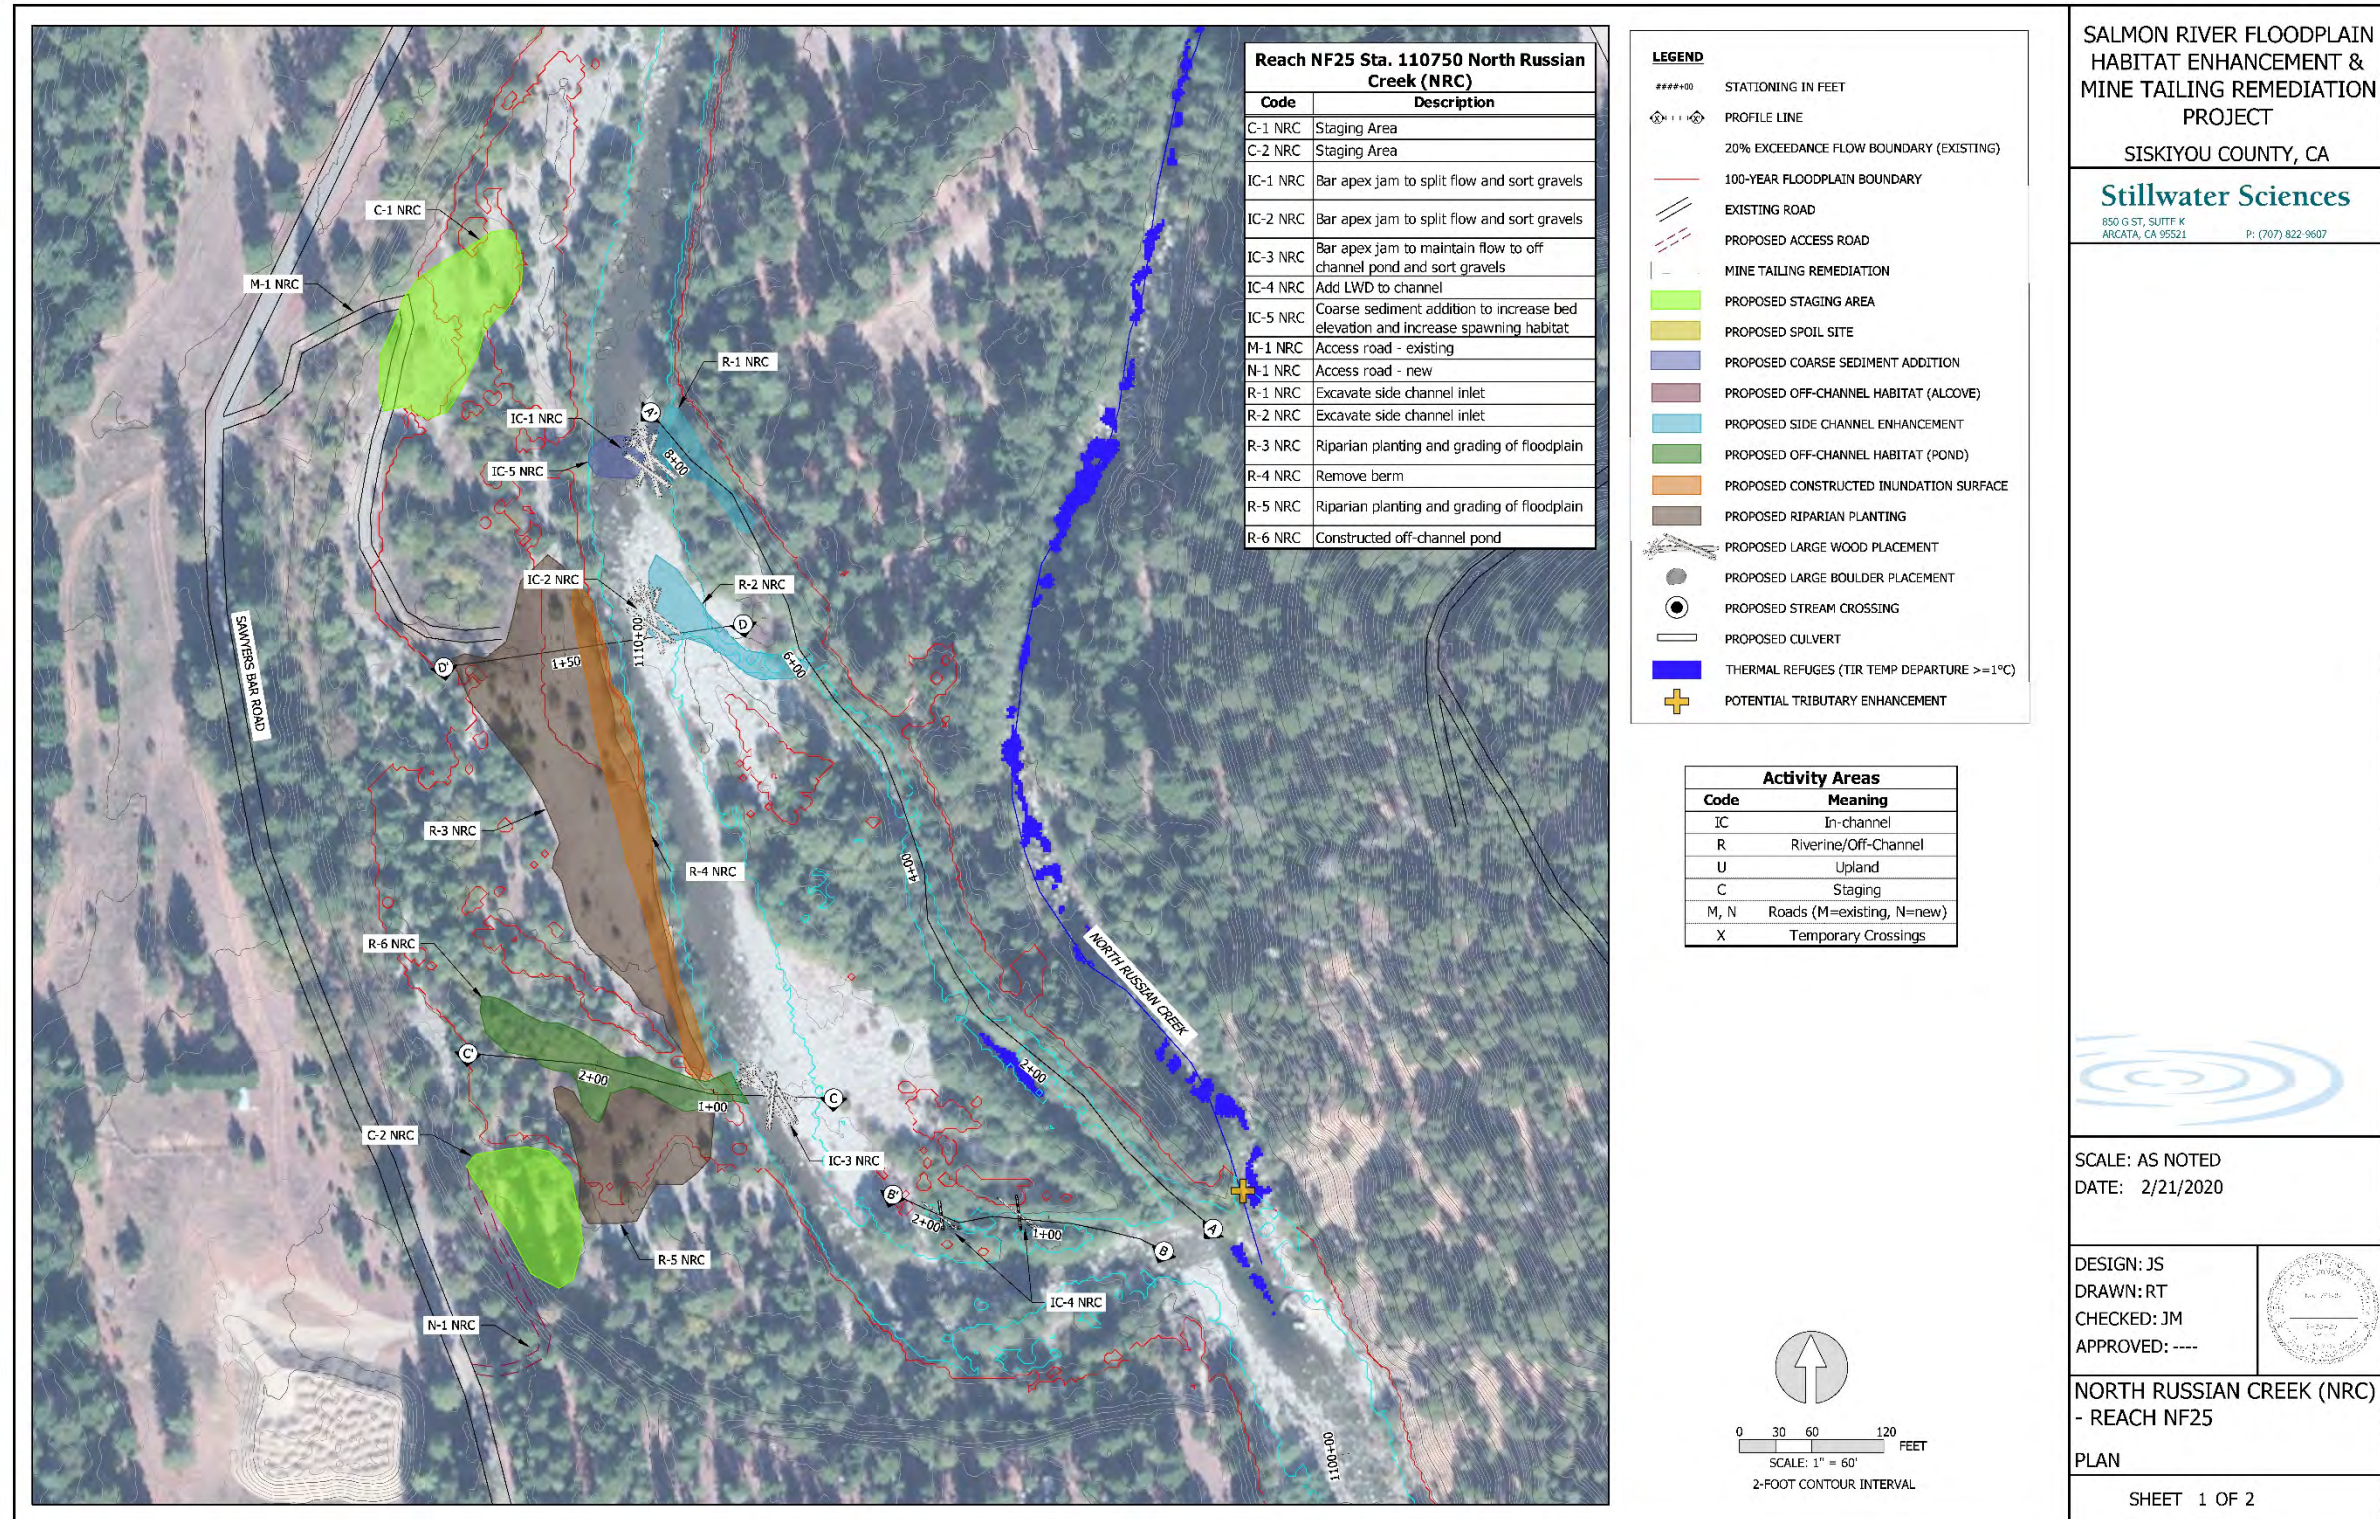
Design plan for North Fork Reach 25 at North Russian Creek.
